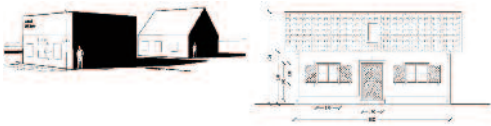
Typical building 1; its geometries and the medium sample building.
